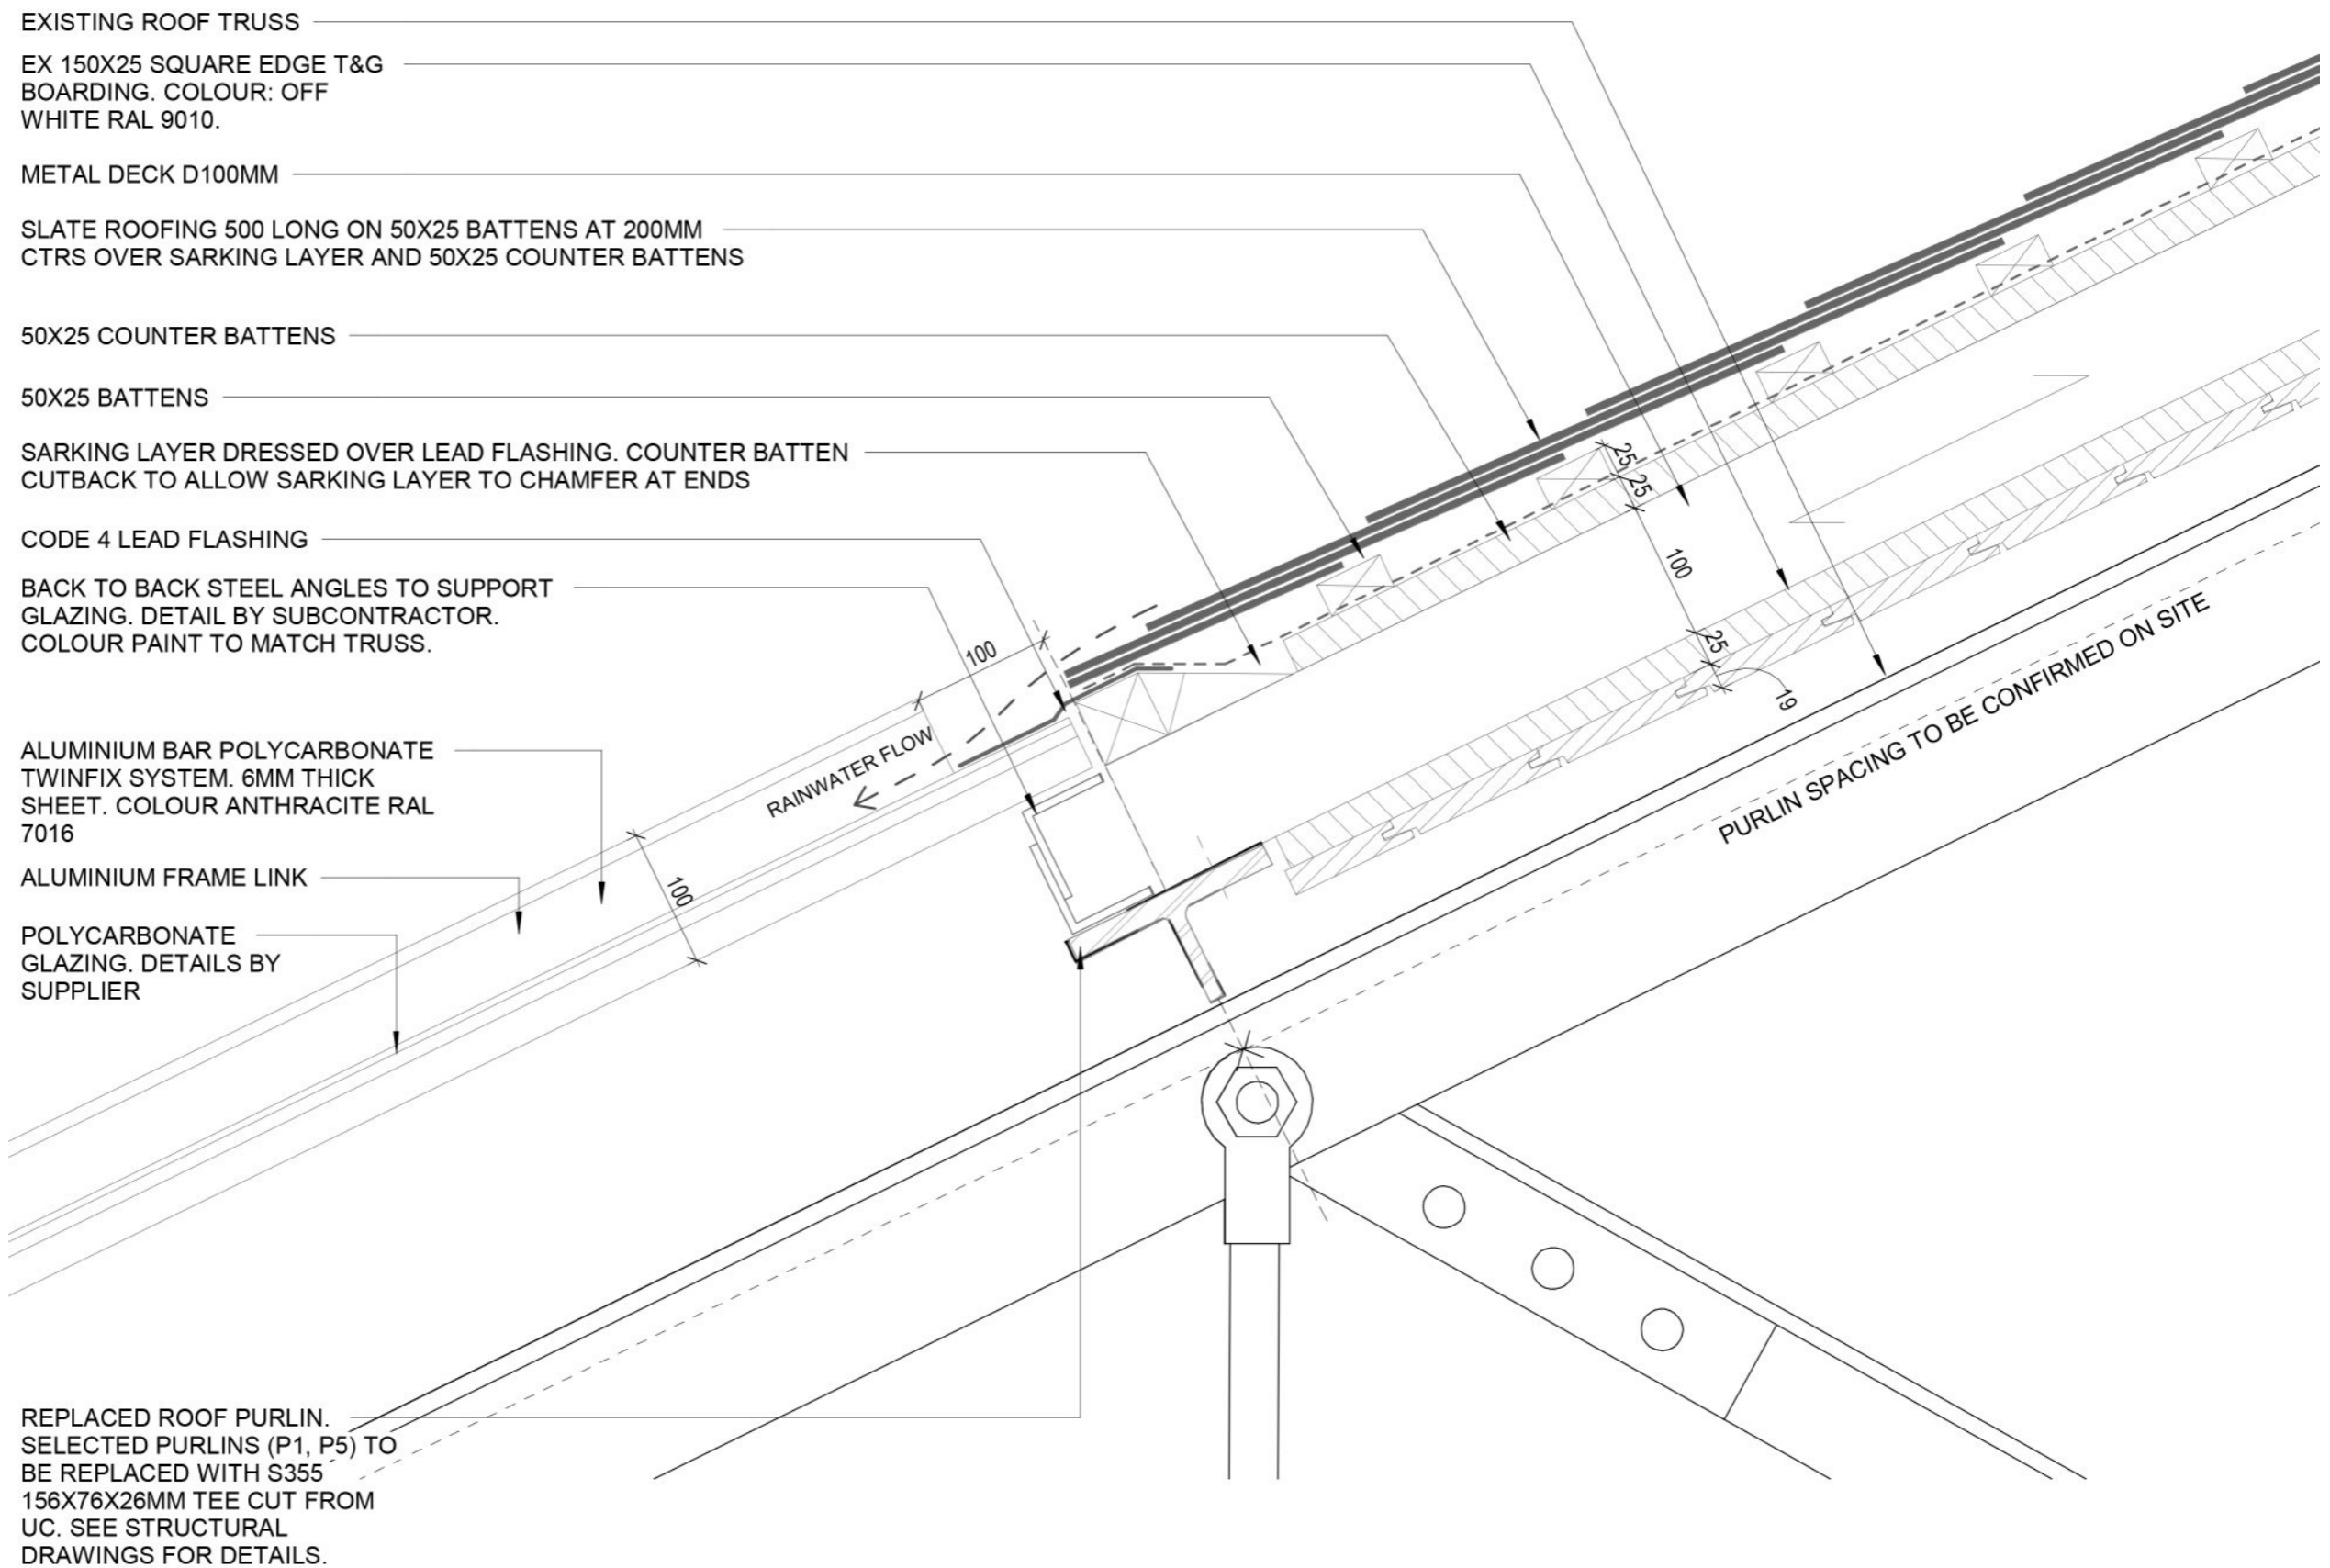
Section detail showing roof light and slate roof interface
